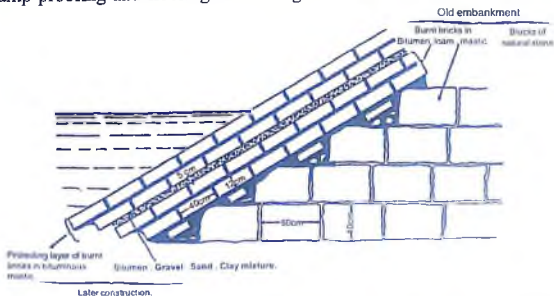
Construction of Tigris Embankment at Assur, [Davey, 1961].
